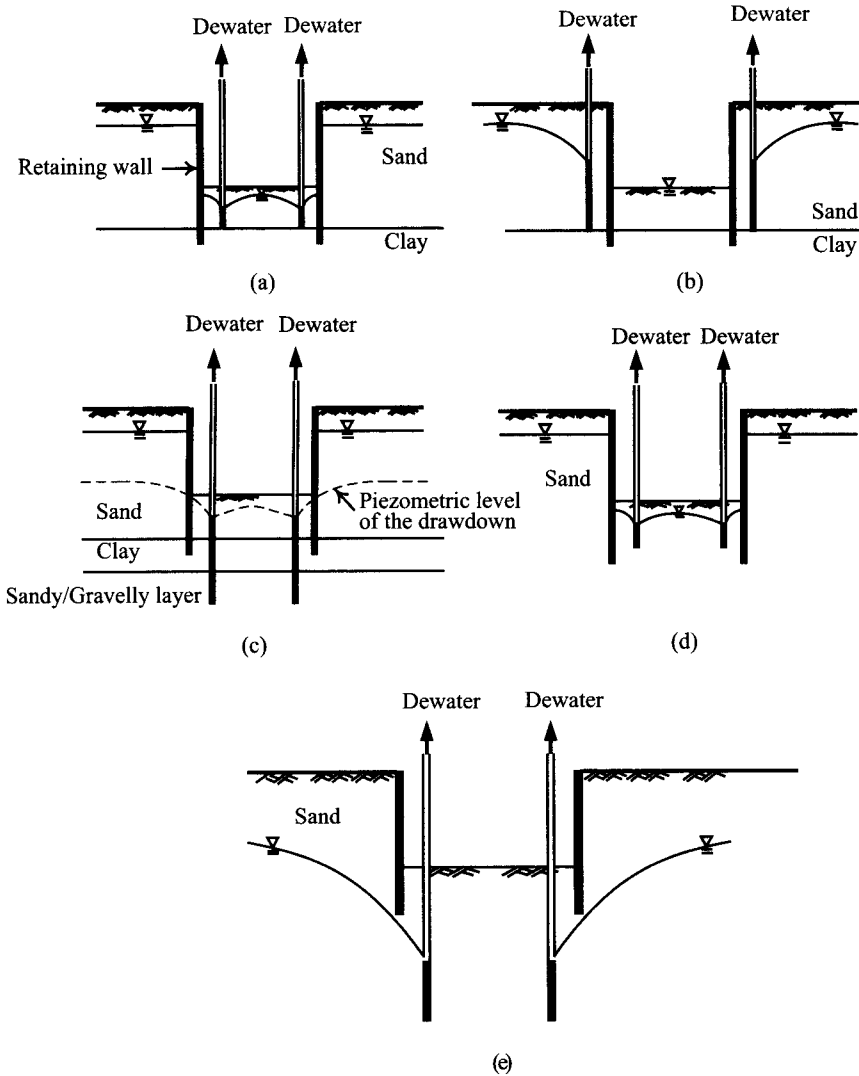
Influence of dewatering in excavations: (a) dewatering within the excavation zone and above an impermeable layer, (b) dewatering outside of the excavation zone and above an impermeable layer, (c) dewatering in a sandy/gravelly layer below the excavation zone, (d) dewatering in a sandy layer within the excavation zone, and (e) dewatering in a sandy layer below the wall bottom.
